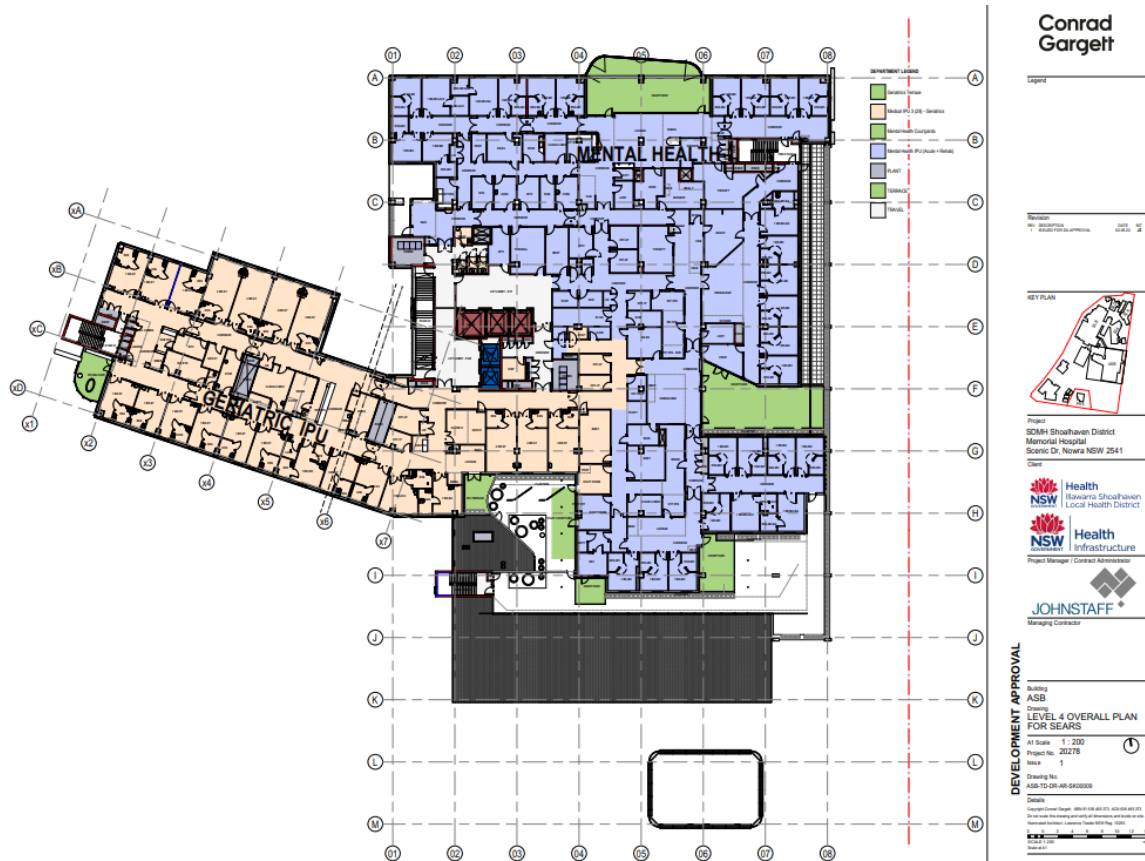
Level 04 General Arrangement (Conrad Gargett)
